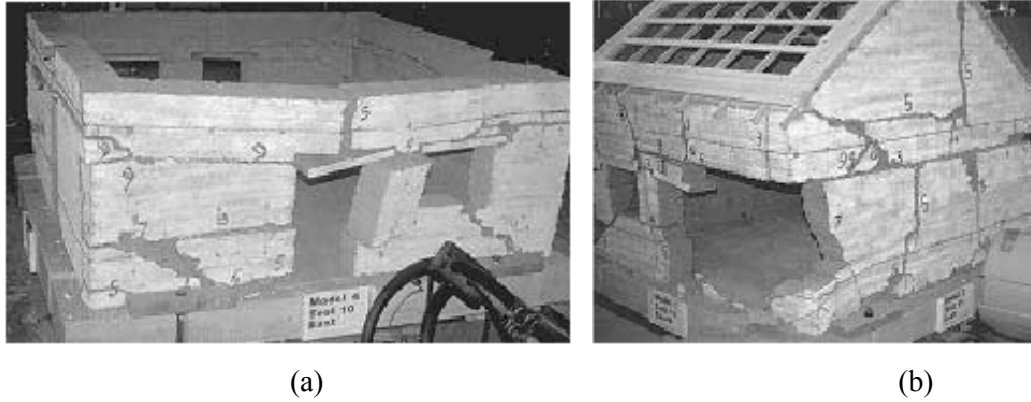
East wall of Model house 4 (a) after test level X and east wall of model house 7 (b) after test level X(2) (Leroy Tolles et al 2000).
